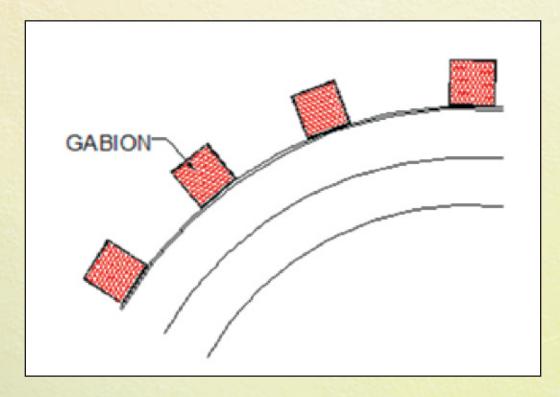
Typical scheme of Gabions as Crash Barrier on Hilly Roads
